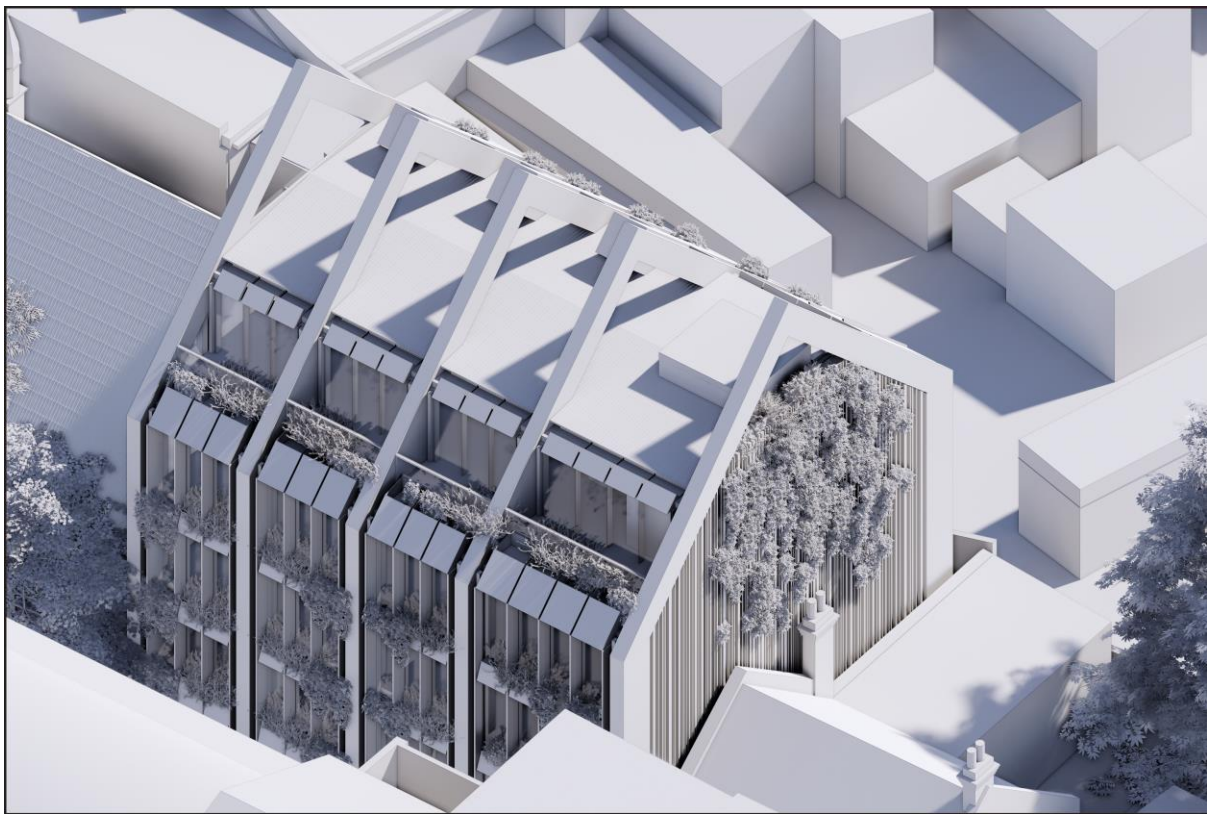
View to the south-west of the proposed rear building demonstrating how the open pitched portals are integrated into the building design and reflect the character of the pitched roof forms of The Kirk and surrounding residential buildings (Source: Em Be Ce Architects)
